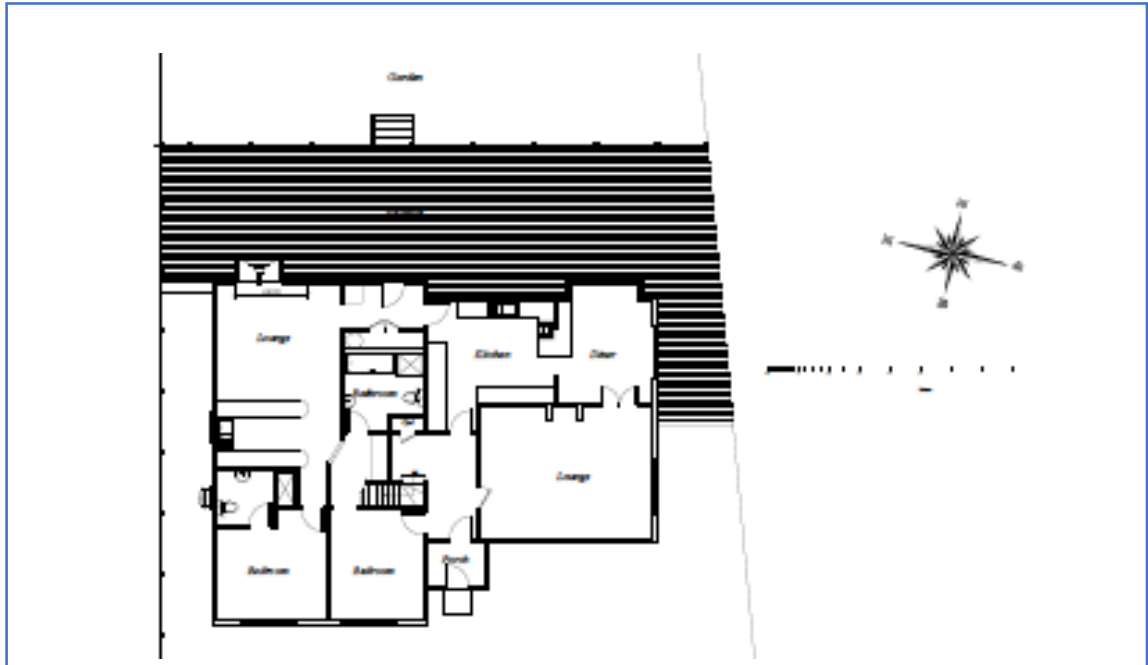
Proposed Site Layout (extracted from submitted plans)
